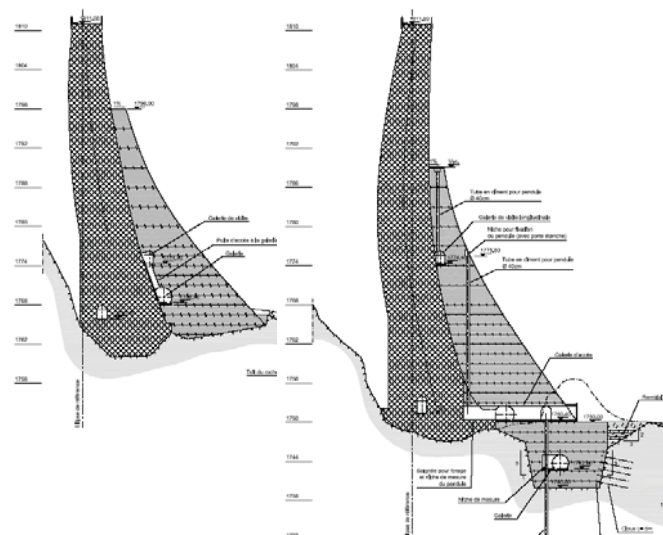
Rehabilitation of Les Toules arch dam, Typical cross-section (left), Cross-section at bloc No. 6 (right) with local deepening of the strengthening
